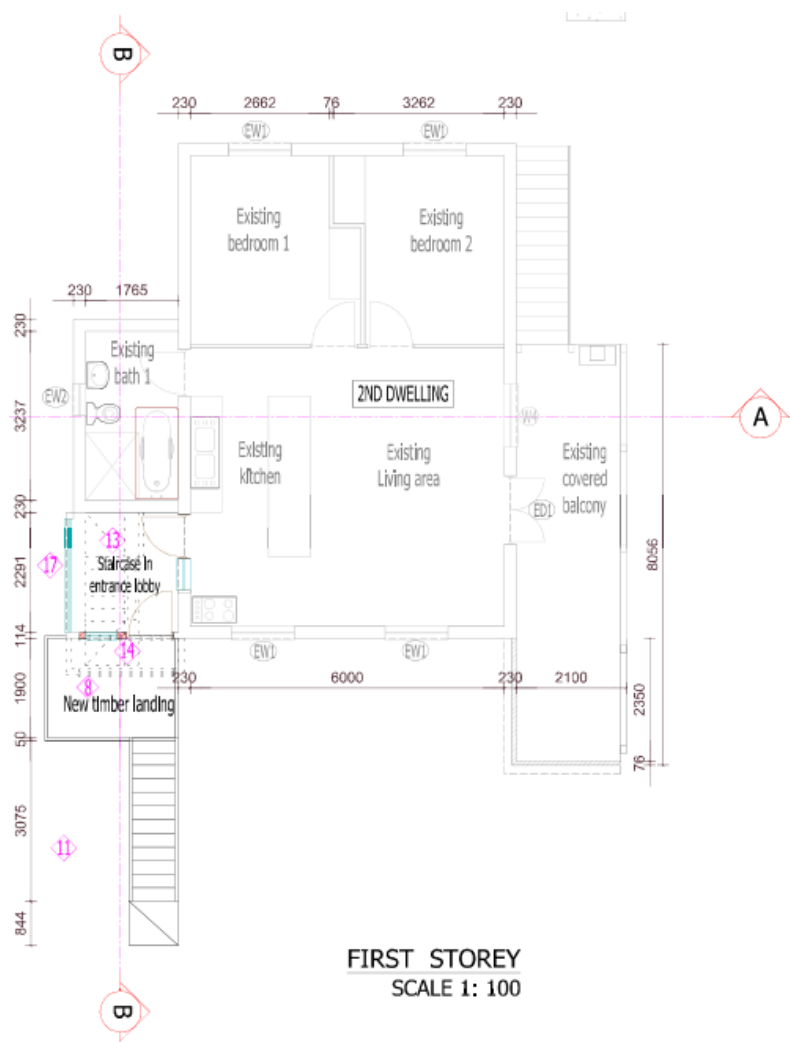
First Storey Floor Plan (Scale 1:100) — Proposed Second Dwelling Unit (First Floor), Erf 556 Fisherhaven
